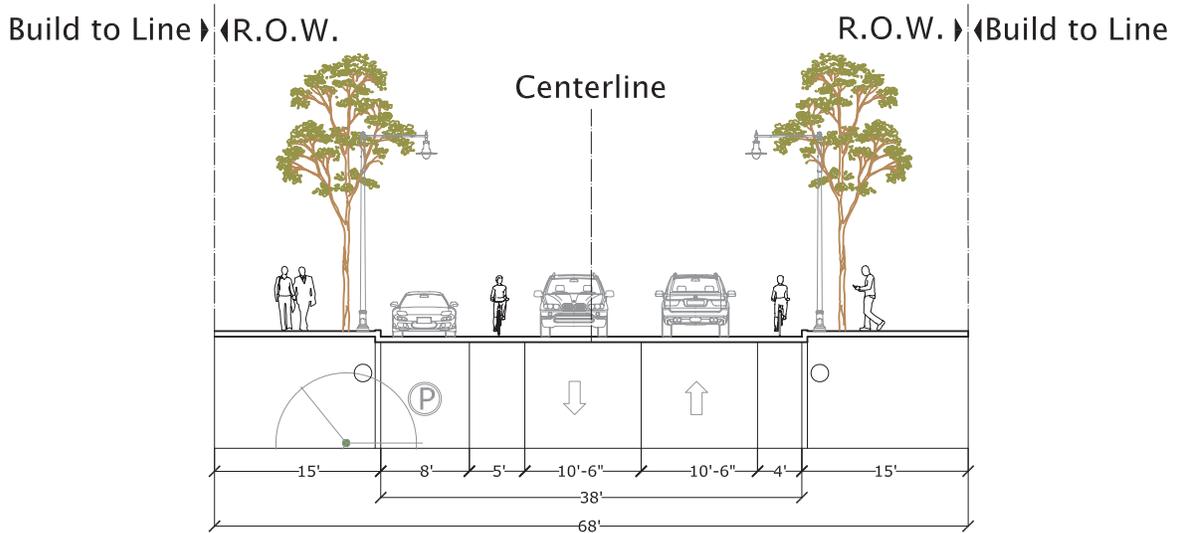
SECONDARY STREET B ST:59:29:BL
